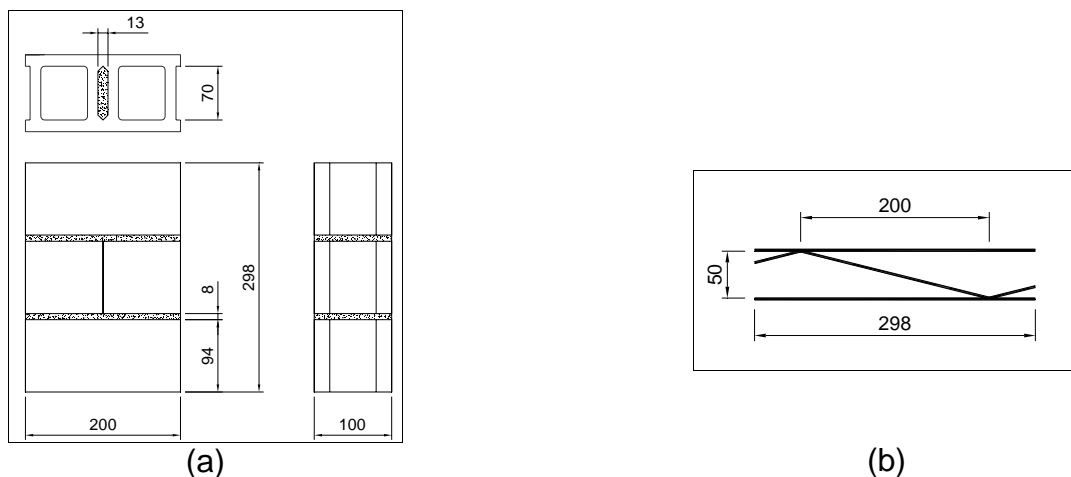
Masonry prisms; (a) geometry of block and prisms; (b) truss reinforcement (dimensions in mm)
